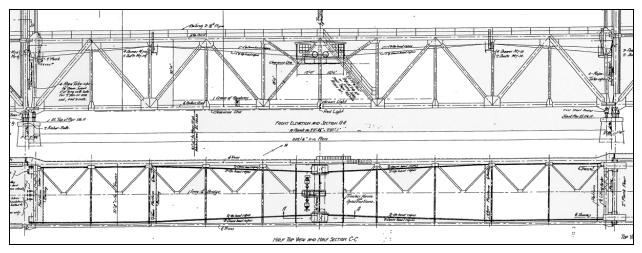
Elevation (above) and Plan (below) of Lift Span [For Full Plan See Figure O-11]
